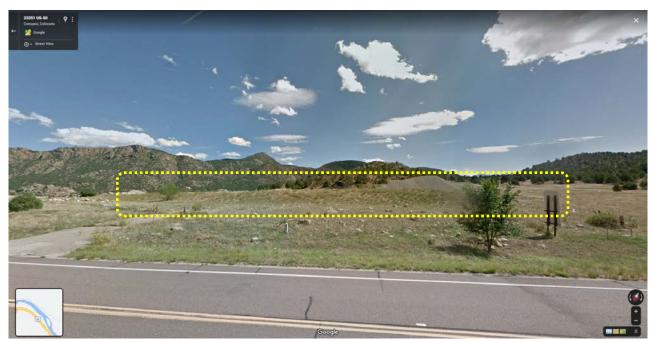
Visual berm opposite active highwall from Hwy 50 (Google Maps street view, 2018 image).
